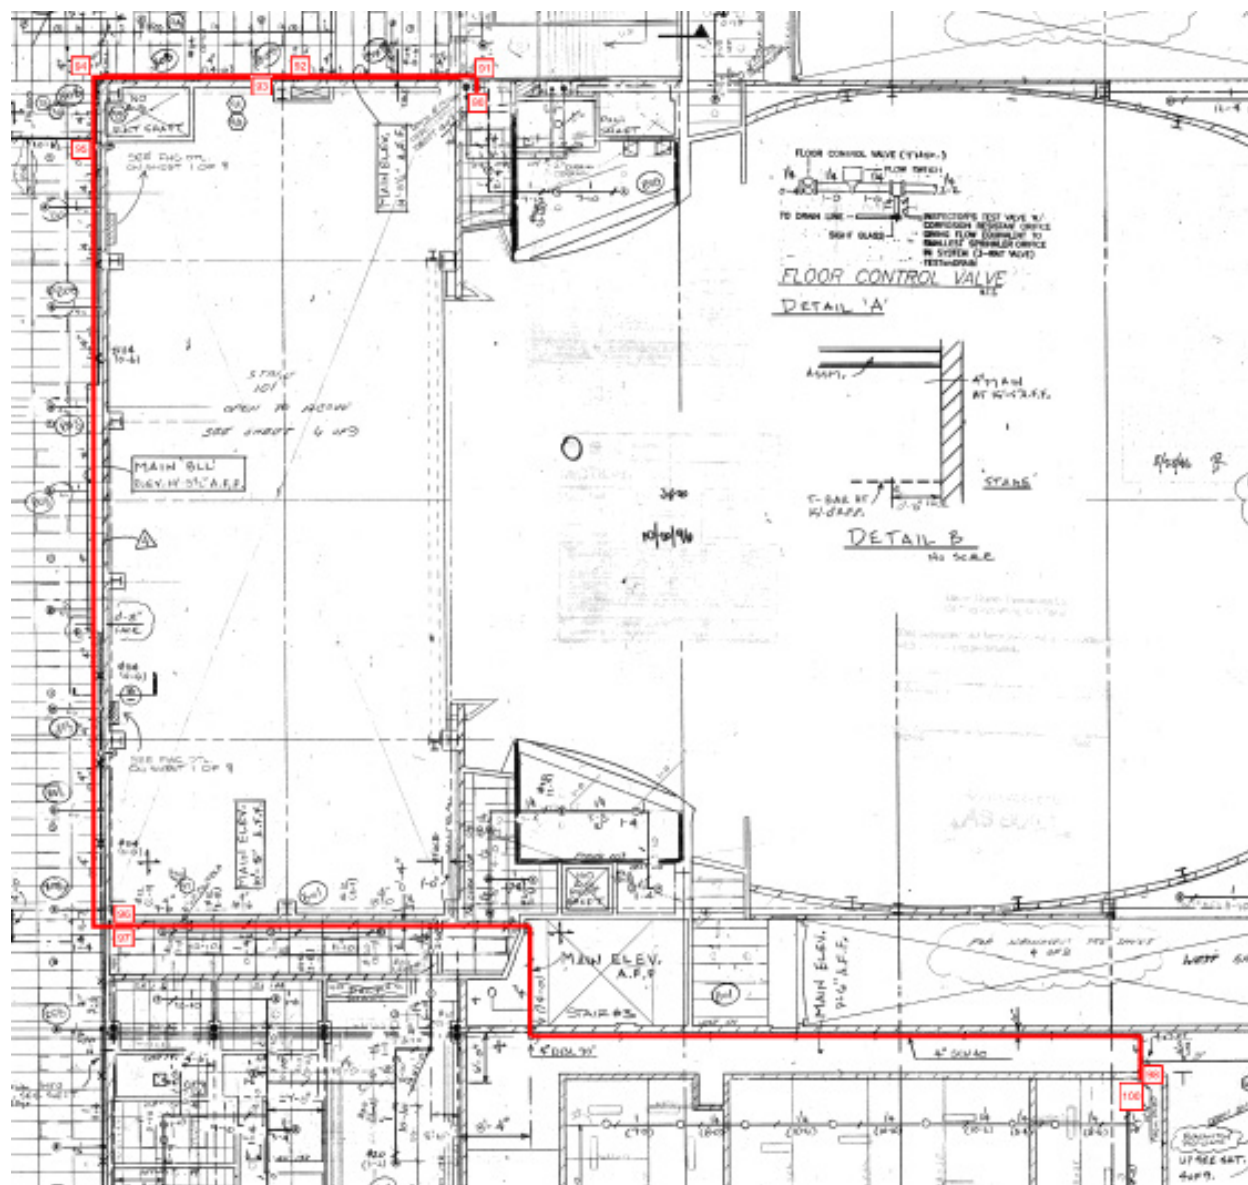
Orchestra stage level plan showing hydraulic calculation nodes 91 - 100.
